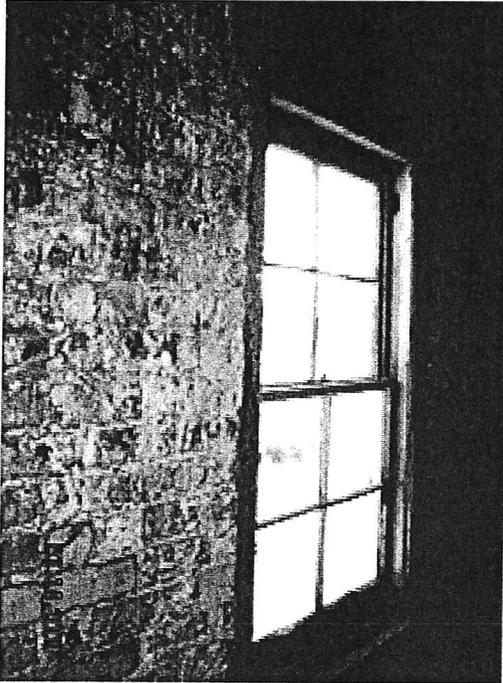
ROOM 21 CLOSET A COLUMN
